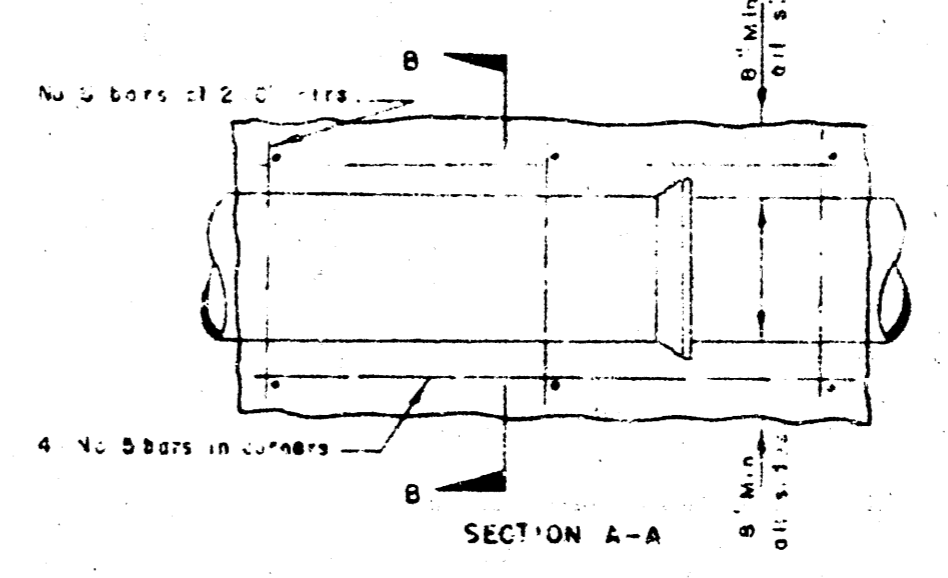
DETAIL OF DROP STACK FOR EXISTING MANHOLES IN GROUND WATER
